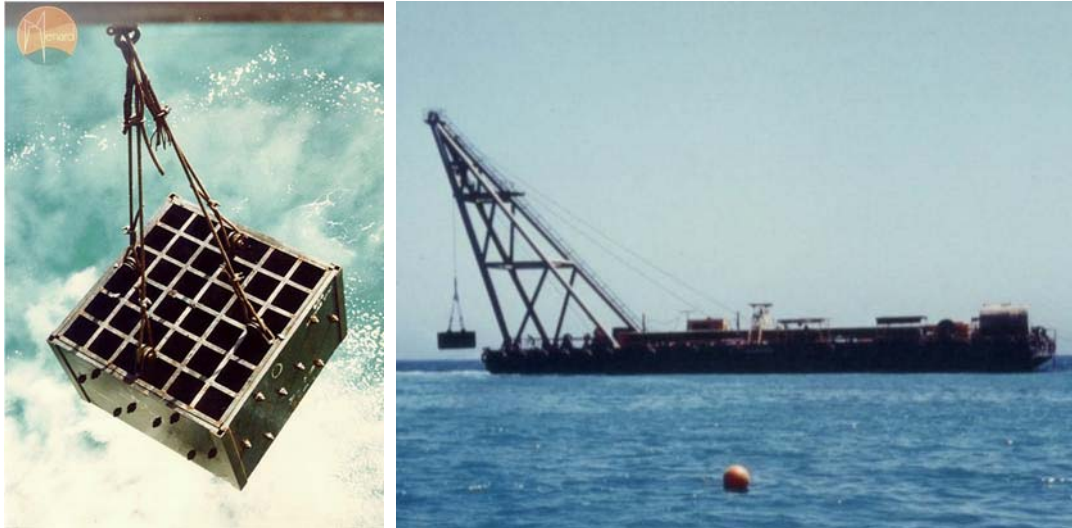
Reinforced concrete pounder encased in a steel box
